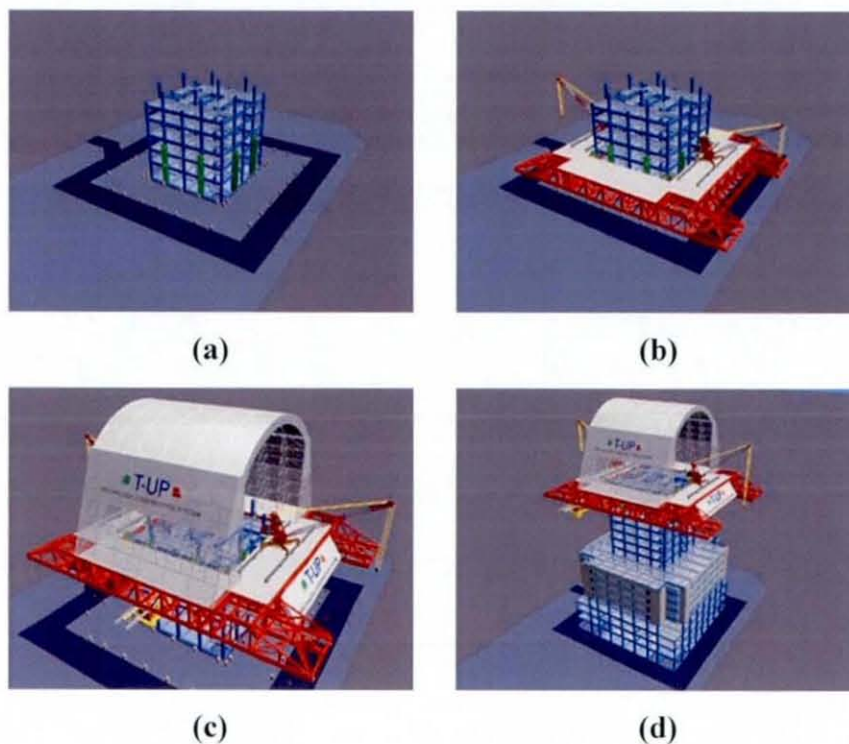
T-Up build process: (a) erection of building core; (b) erection of crane platform; (c) crane platform raised and 'hat' assembled; (d) 'hat' raised and building assembled from below (Taisei, 1995).
